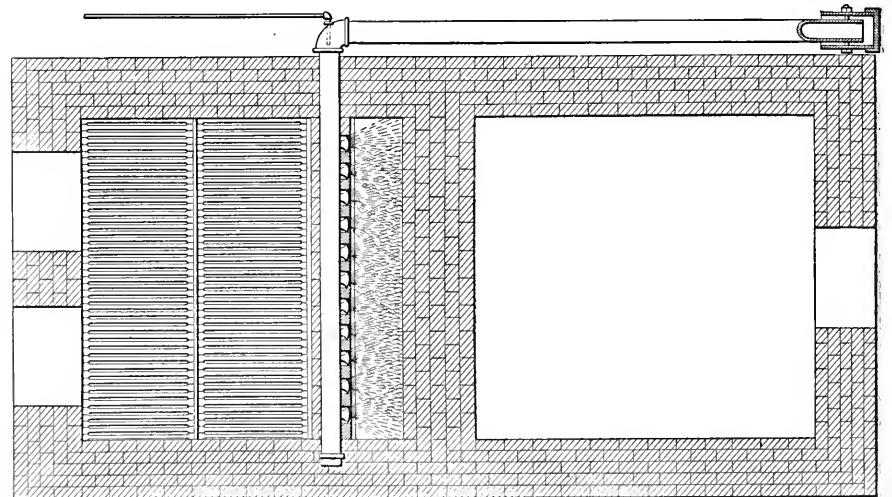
SECTIONAL PLAN OF BOILER SETTING
